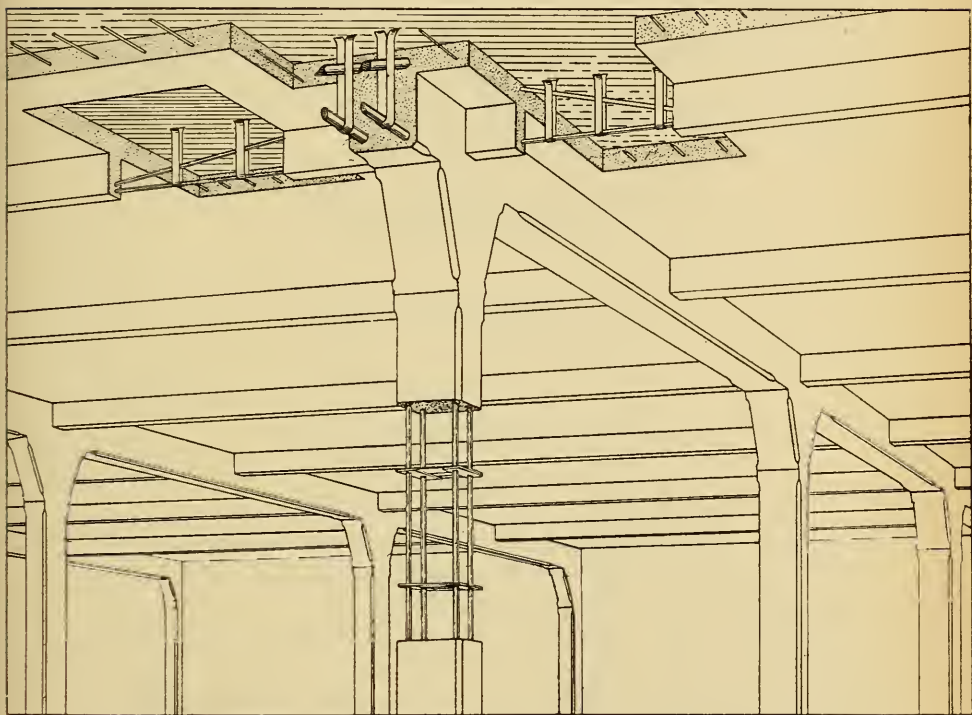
GENERAL VIEW OF COLUMNS, GIRDERS, BEAMS AND FLOORS.
